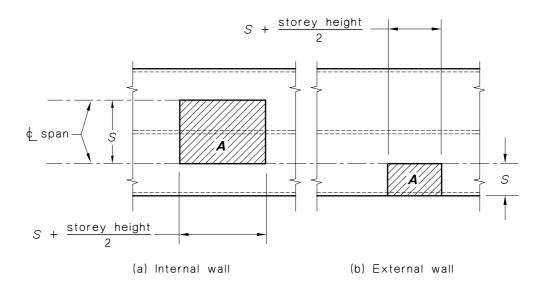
LONG WALLS WITH SMALL OPENINGS OR WITHOUT OPENINGS (Principal reinforcement in one direction only)
